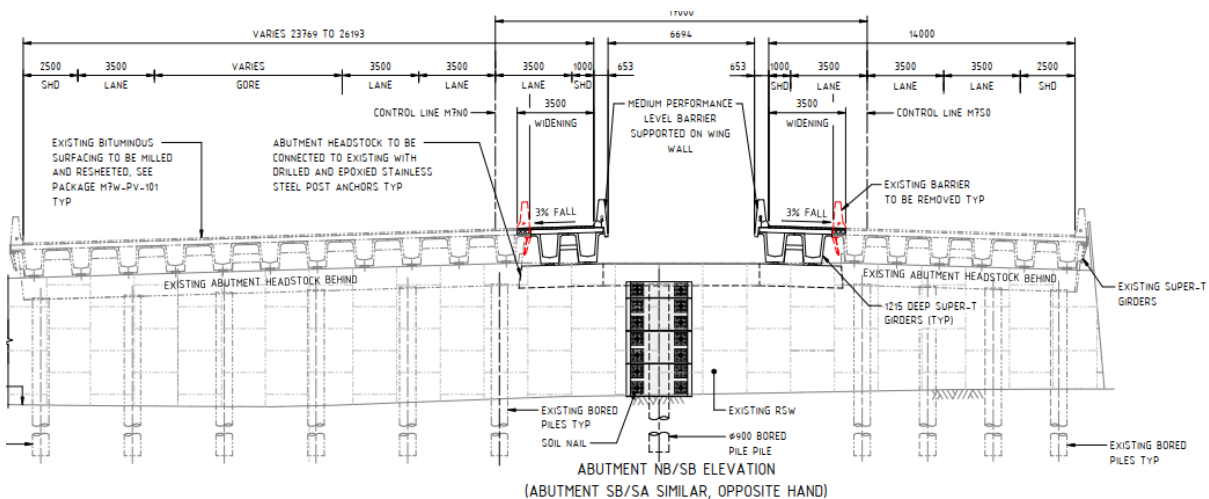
Abutment and soil nail strengthening at Bridge Widening Infra 25.10/25.11
